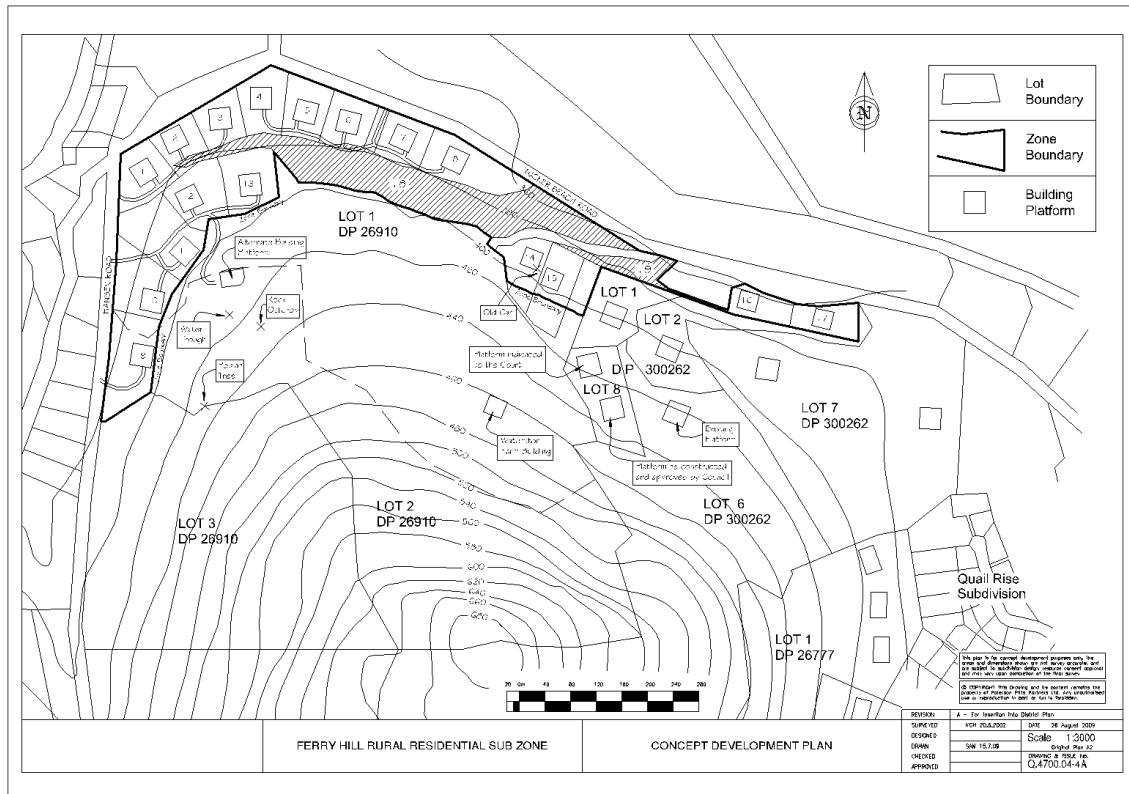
Figure XX: Rural Residential Ferry Hill Sub Zone Concept Development Plan
